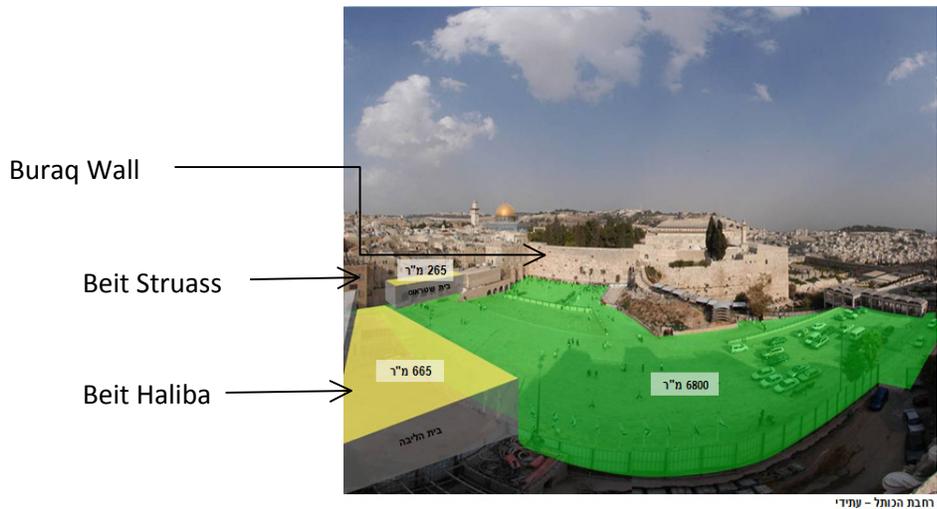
new constructions and Judaization of Al-Buraq Wall Plaza west of Al-Aqsa
